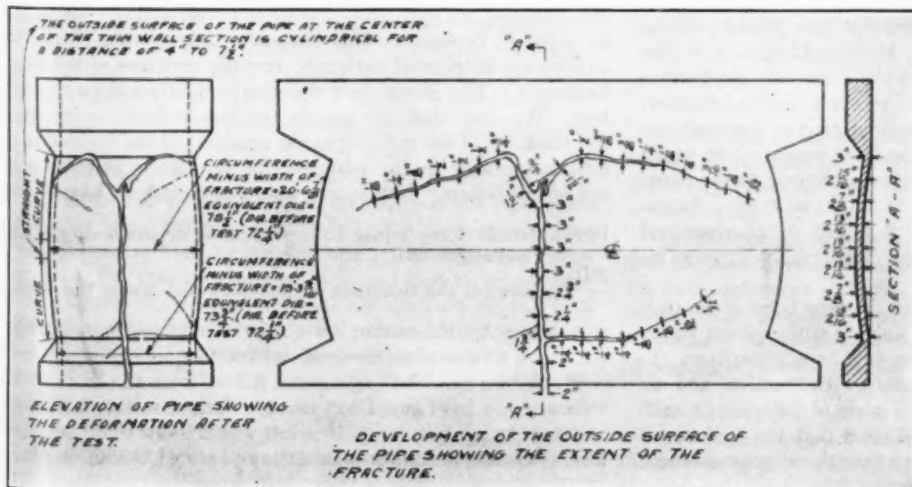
ELEVATION OF PIPE SHOWING (a) DEFORMATION AFTER TEST, AND (b) DEVELOPMENT OF OUTSIDE SURFACE OF PIPE SHOWING EXTENT OF FRACTURE
